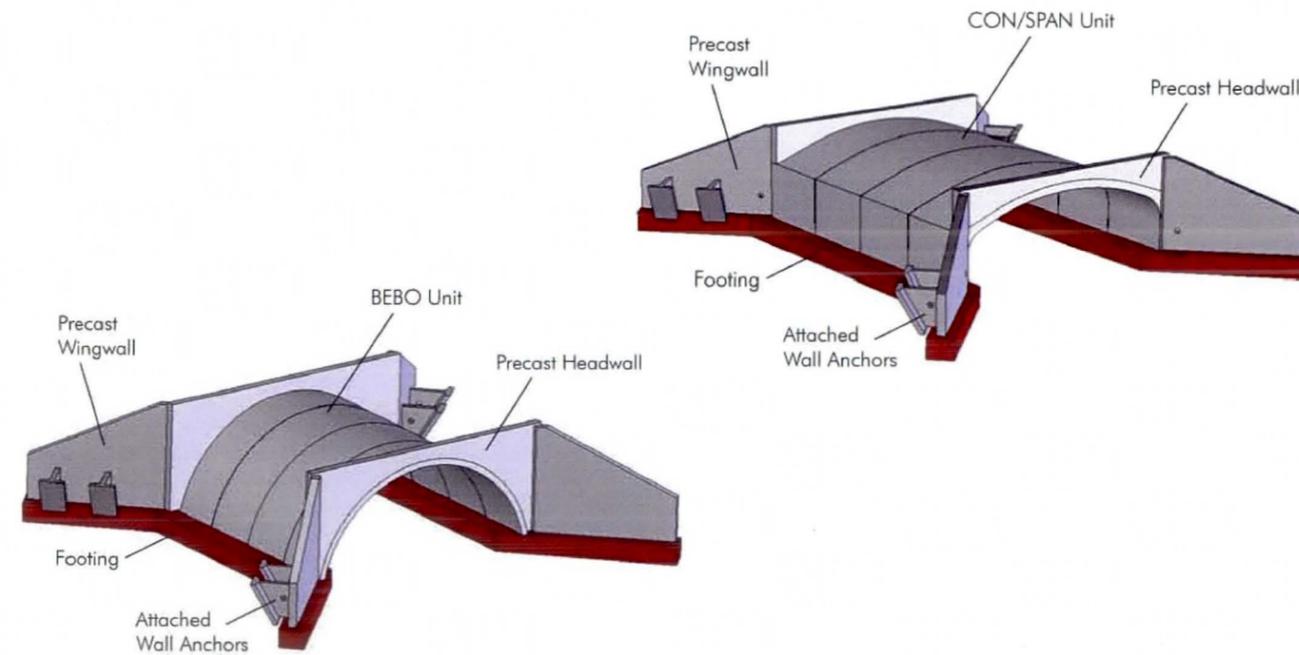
CON-SPAN AND BEBO PRE-CAST CULVERT OPTIONS
